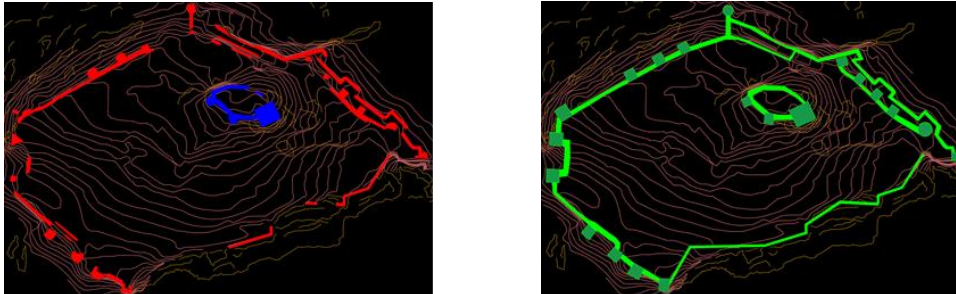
Plan reconstruction of the outer walls based on the location and current remains of Castillo de la Estrella.
